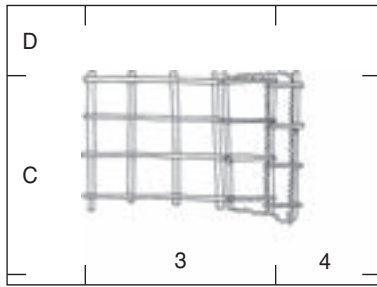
Dorestad, Hoogstraat II: reconstruction of dam segment HS-II 5; scale 1:400. Legend: see fig. 36.
